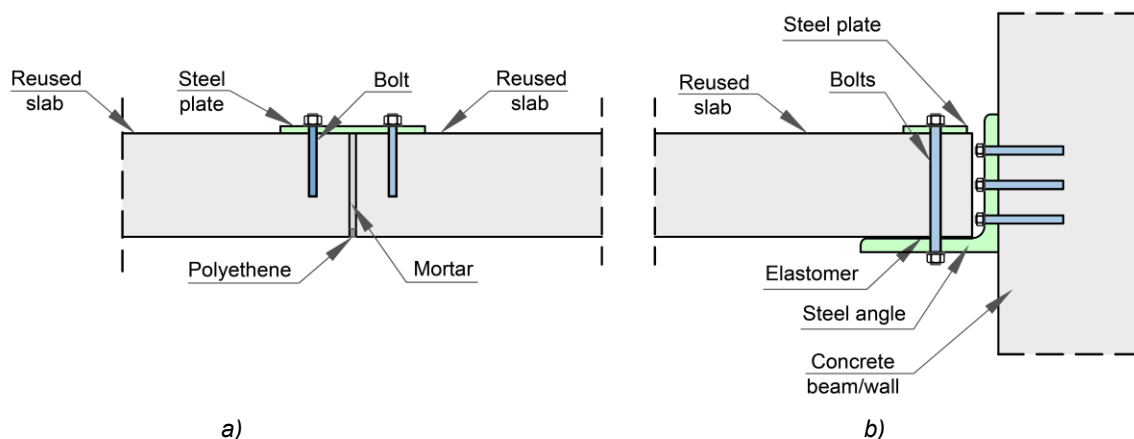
Cut slab segment connections: a) slab-to-slab, b) slab-to-concrete beam/wall [39]
